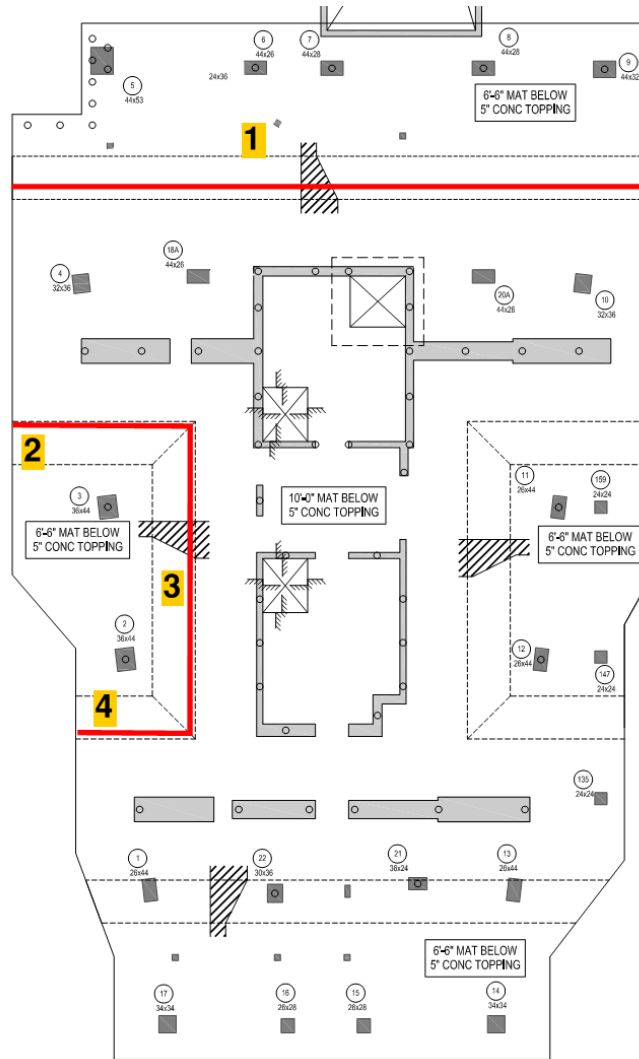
Location of Mat Foundation One-Way Shear Checks (from FO-100.00)
